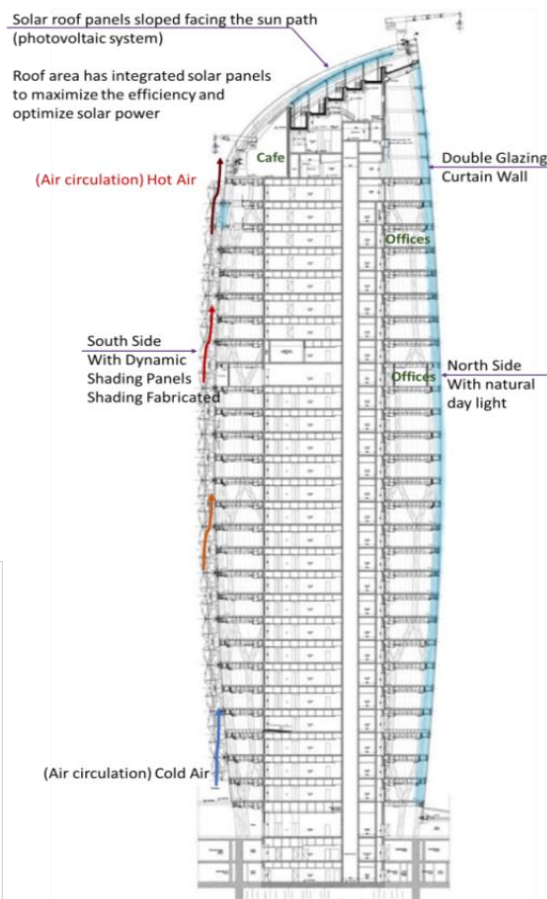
Al Bahar section showing the technical elements of the dynamic facade system, [5]
